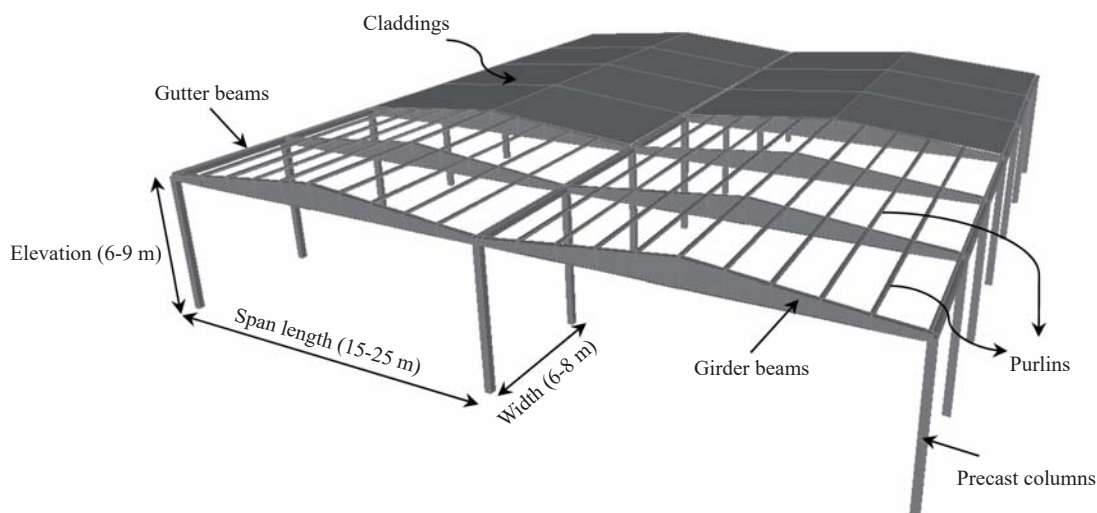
Typical elements and configuration of one-story precast industrial facilities
